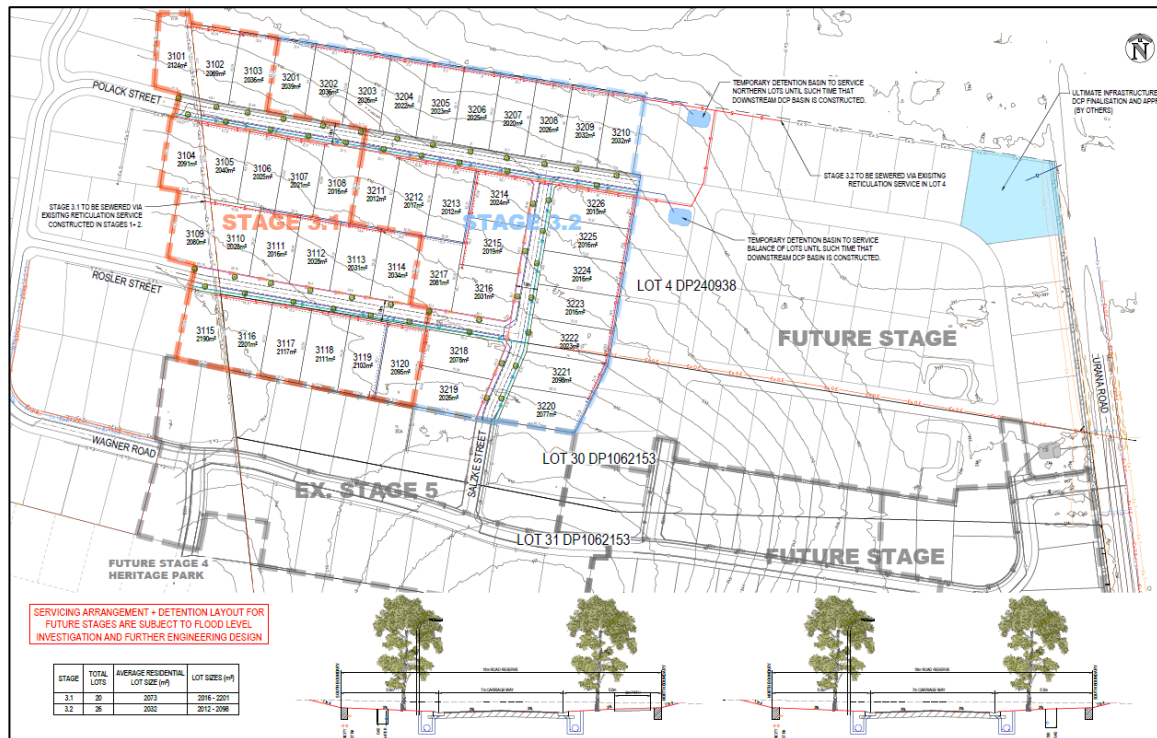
Proposed staging plan and a cross section of the proposed roads
